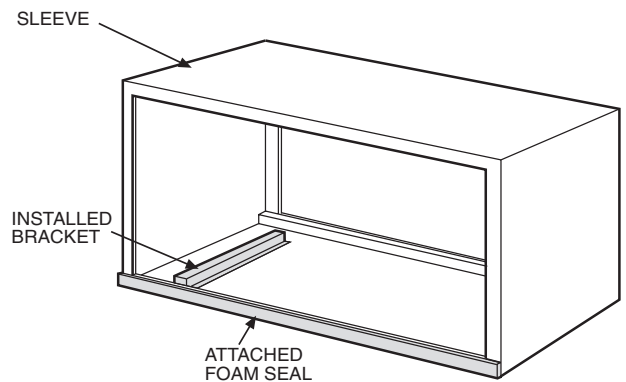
Attach Bracket to Amana Metal Sleeve
